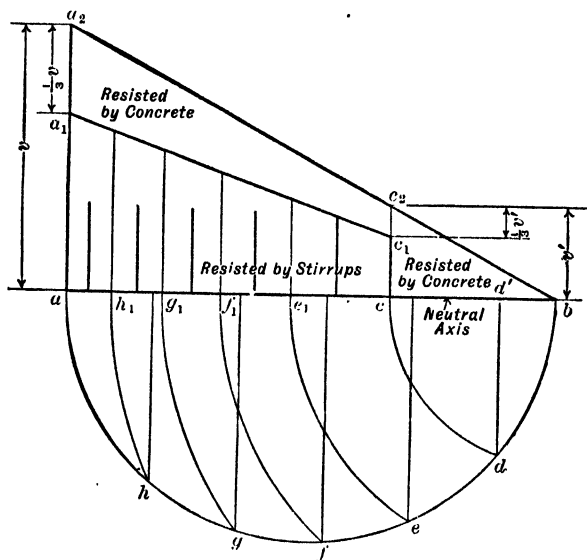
Spacing of Vertical Stirrups for Uniform Load. (Sec p. 526.)
